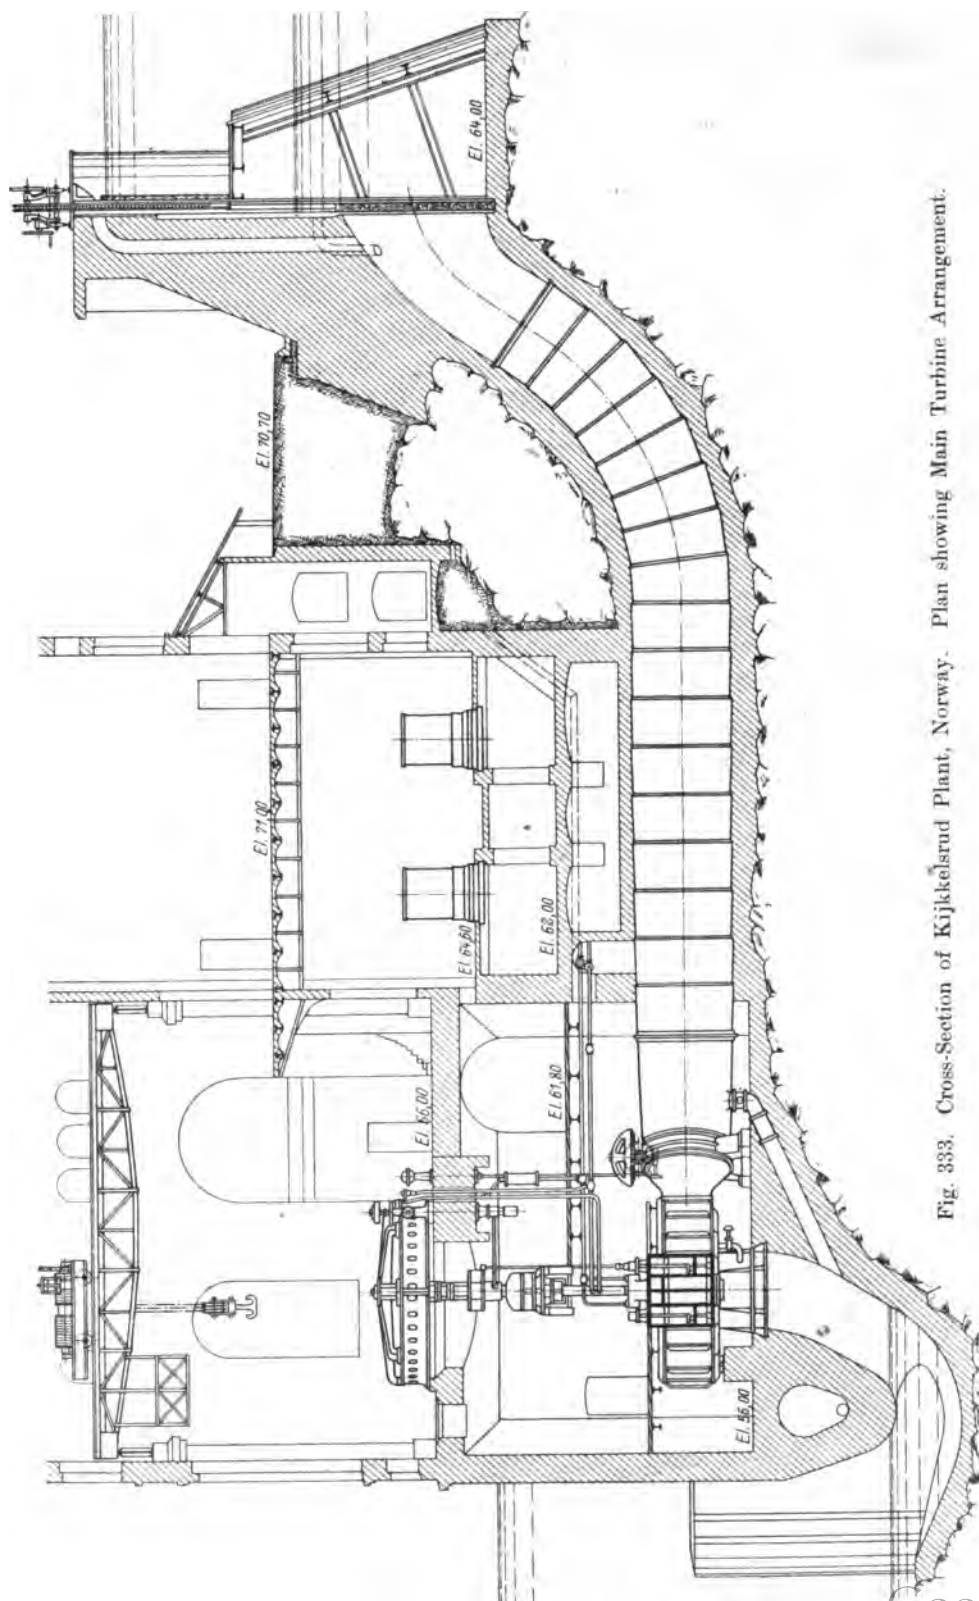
Cross-Section of Kijkkelsrud Plant, Norway. Plan showing Main Turbine Arrangement.
